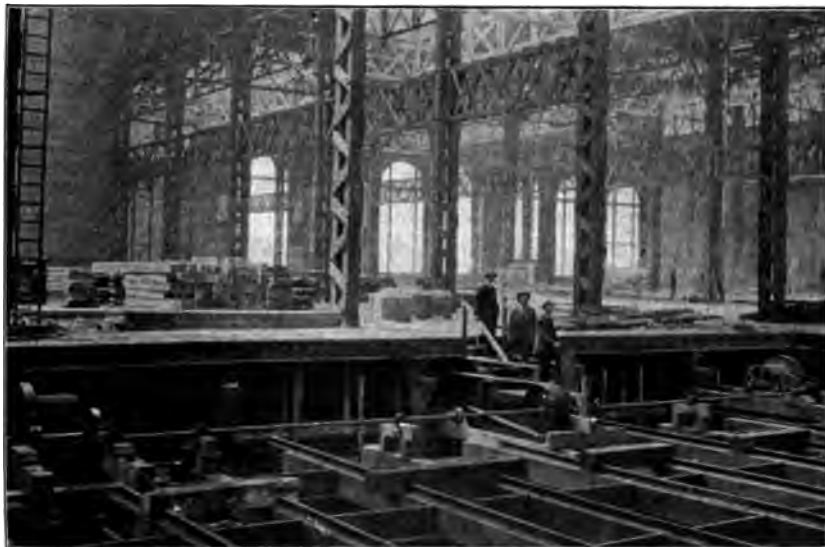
HAULING GEAR FOR TRANSFER TABLE
